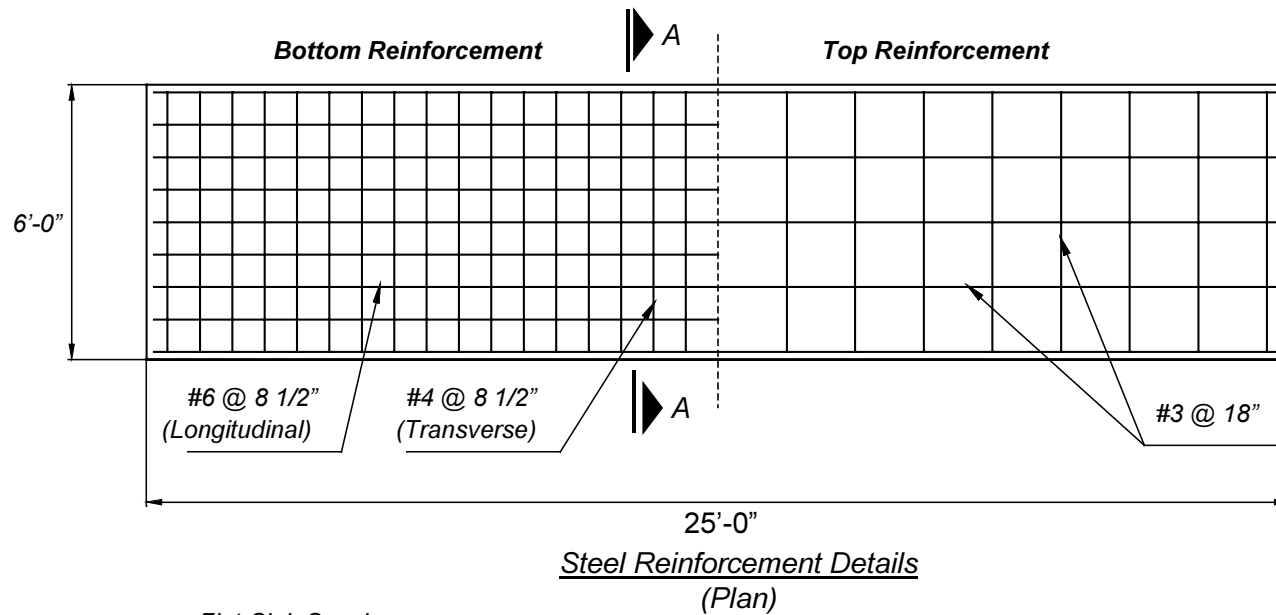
Geometry and Reinforcement Details of Flat-Slab Specimens FS-1 and FS-2
